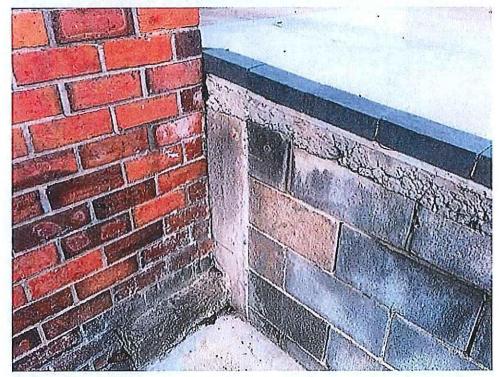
Photo showing intersection of boundary retaining wall and brick wall. Note concrete works performed as part of construction works for 27 Benvenue Road.
